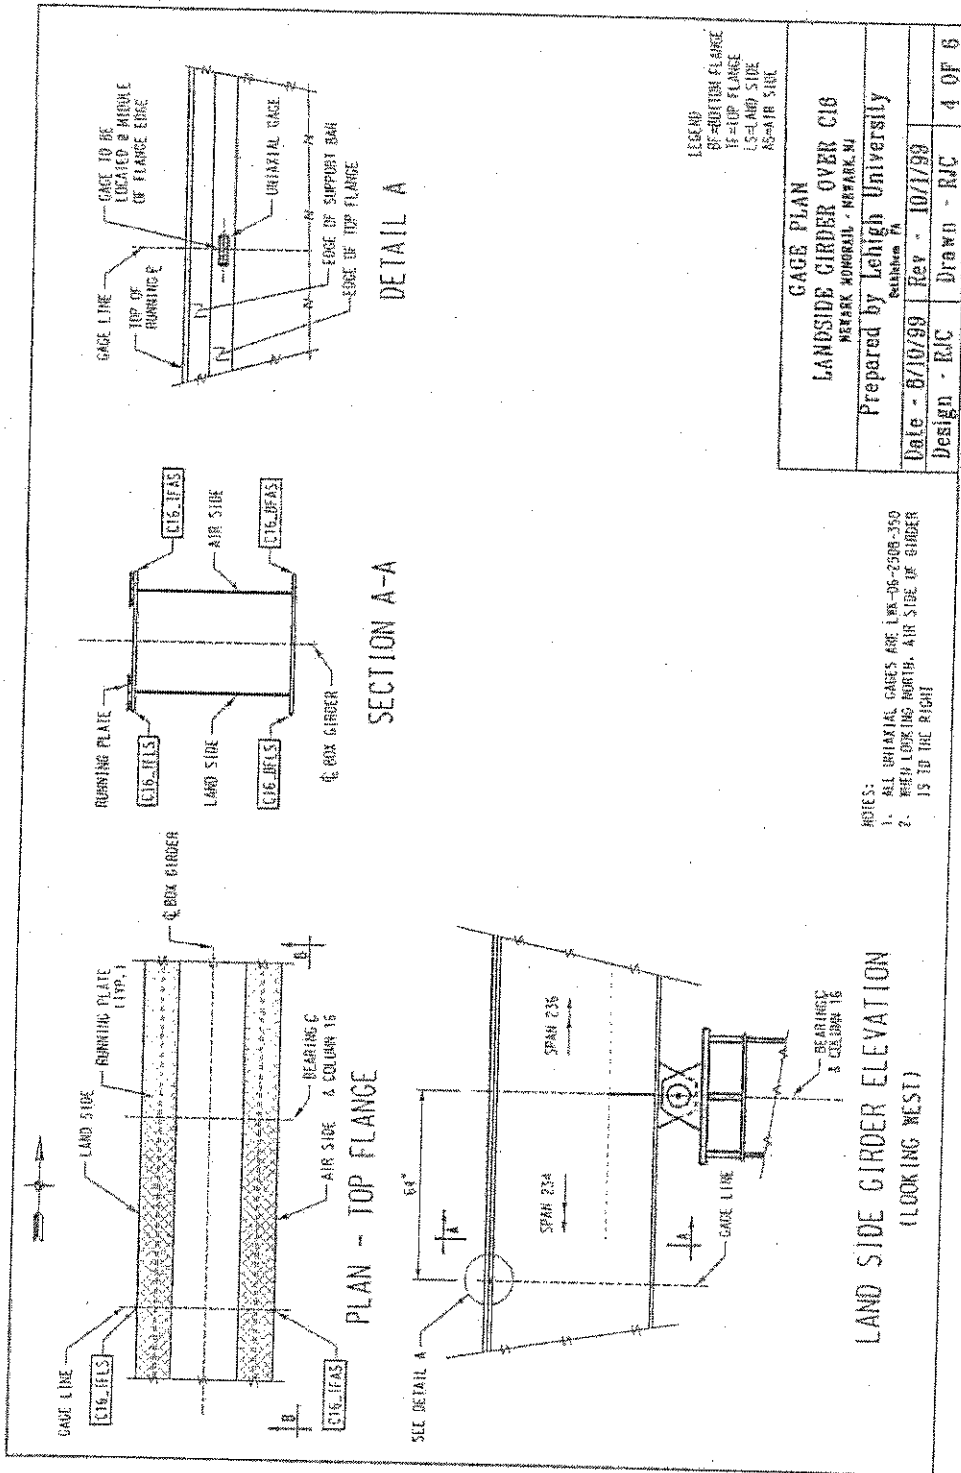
Strain Gage Layout Adjacent to Column 16 – Land Side
